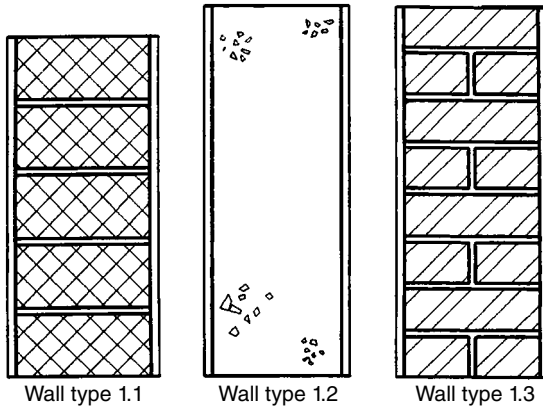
Wall Types 1.1, 1.2 and 1.3.
